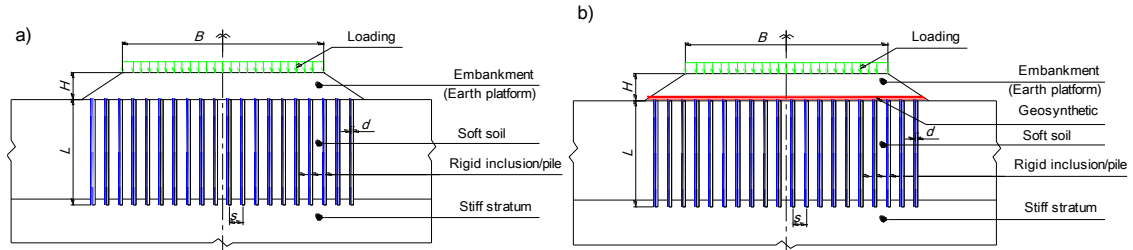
Detail of the reinforcement systems: a) Piled embankment; b) GRPS embankment
